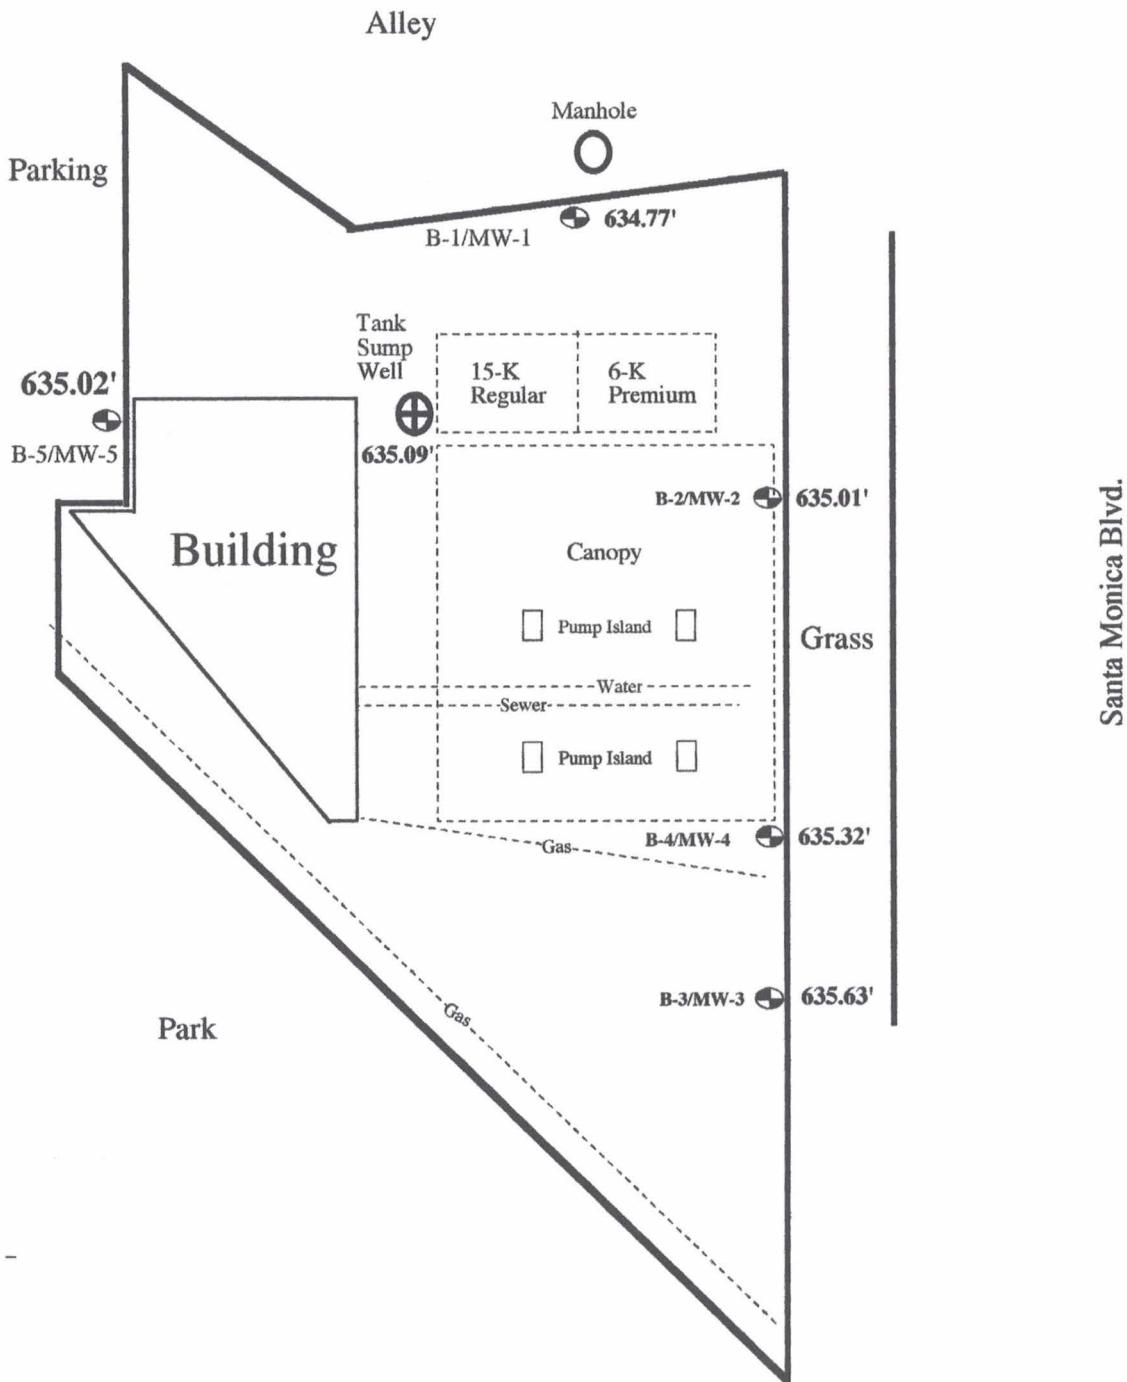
Site Layout, Locations of Soil Borings and Monitoring Wells, and Groundwater Elevations on 06-12-2024
